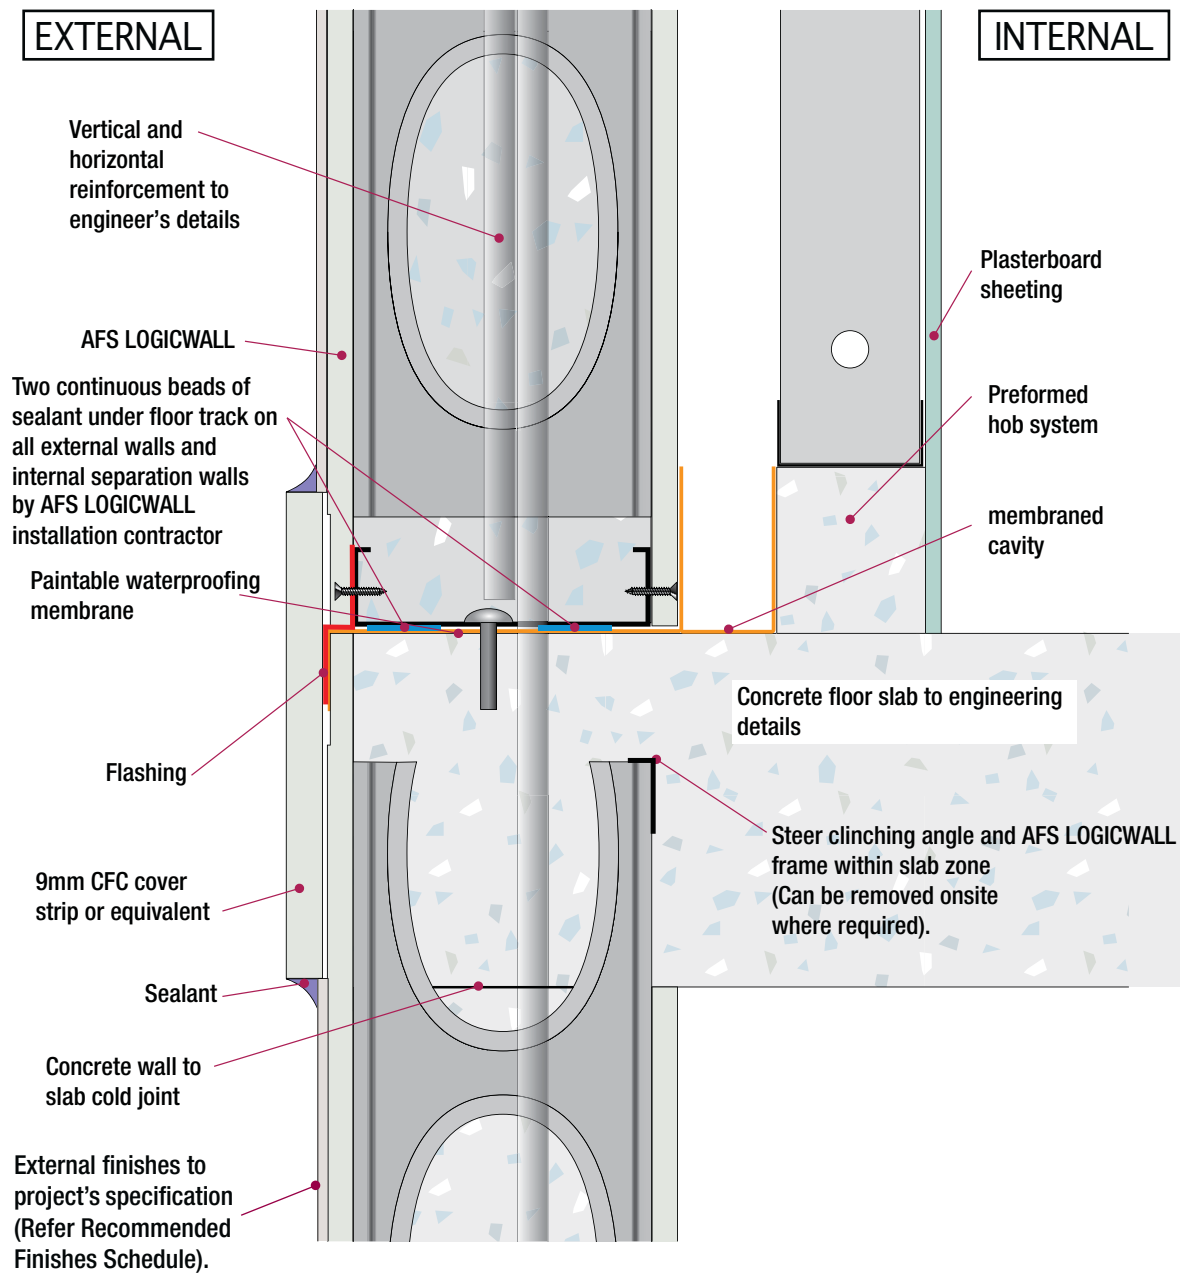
AFS Logicwall® Edgeform at Floor/Slab Junction
